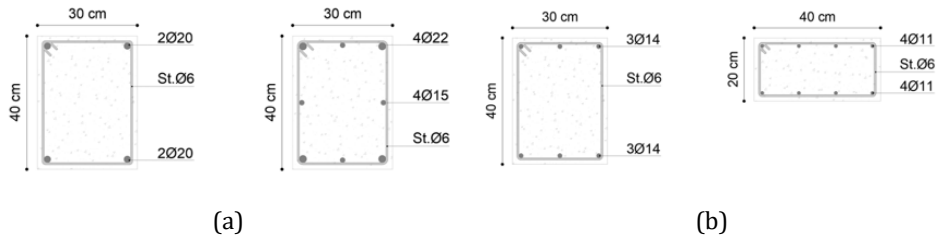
Typical column and beam details: (a) Typical column for TD_1, TD_2, TD_3 (left) and TD_4 (right) and (b) Typical beam for TD_1, TD_2, TD_3 (left) and TD_4 (right)
